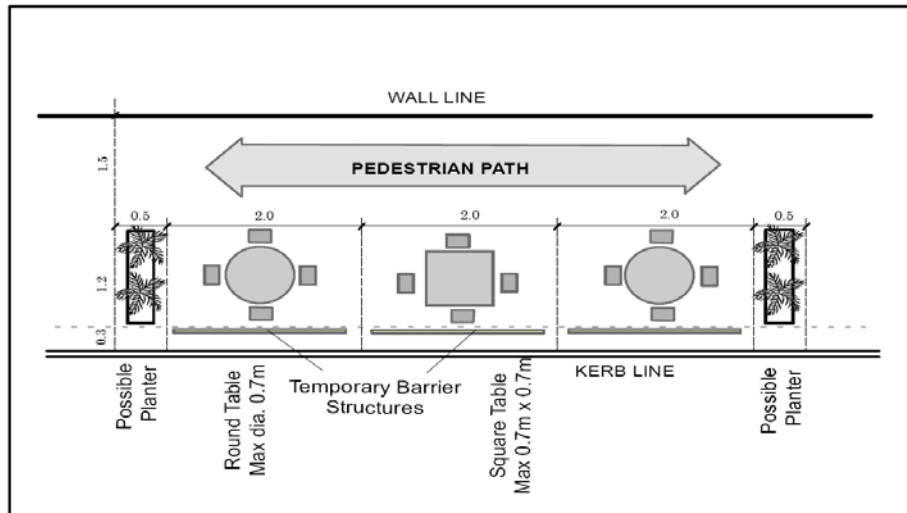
Location and Minimum Setback Requirements for Outdoor Seating
